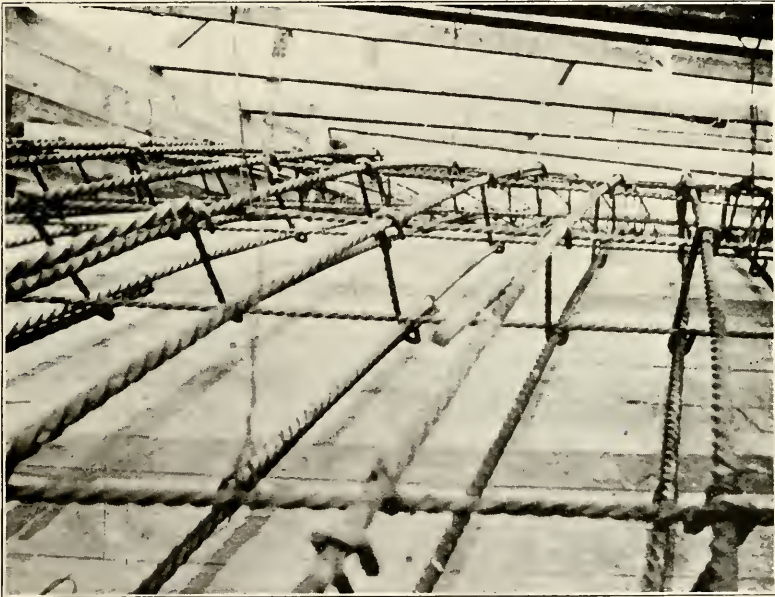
SHOWING SPACING OF TWISTED REINFORCING BARS.
